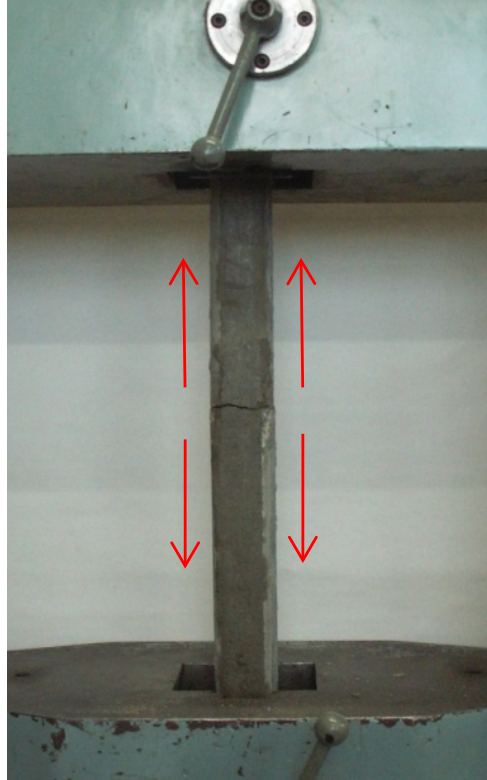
Pull-out shear strength test with Avery universal testing machine.
